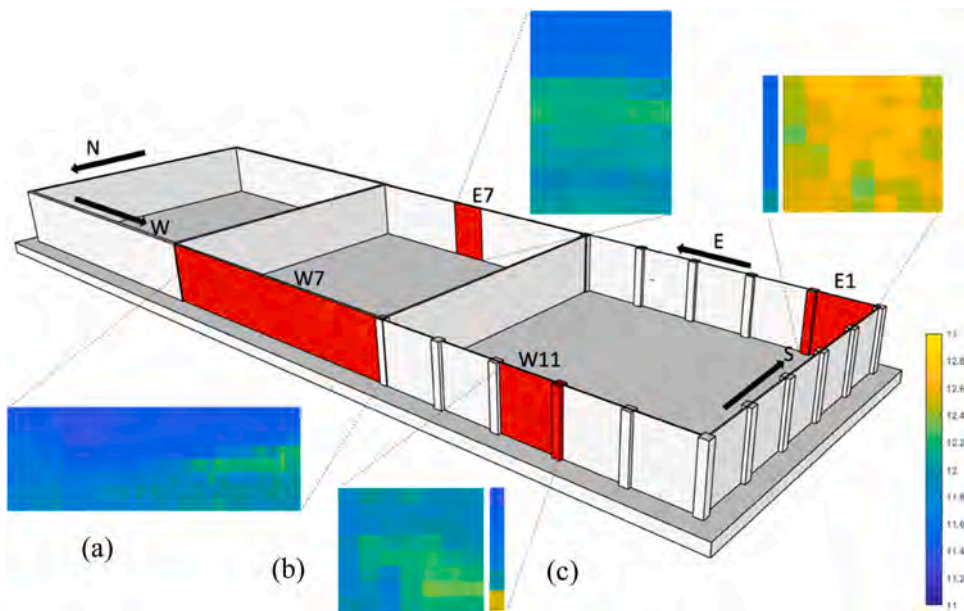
Steel fibers distribution survey: (a): cast in place 60 mm UHDC wall, (b): precast 30 mm UHDC slab, and (c): cast in place 200 × 200 mm² UHDC column.
